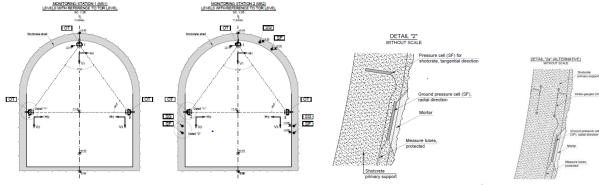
Conceptual plan for Instrument installed under cross-passage⁹.
